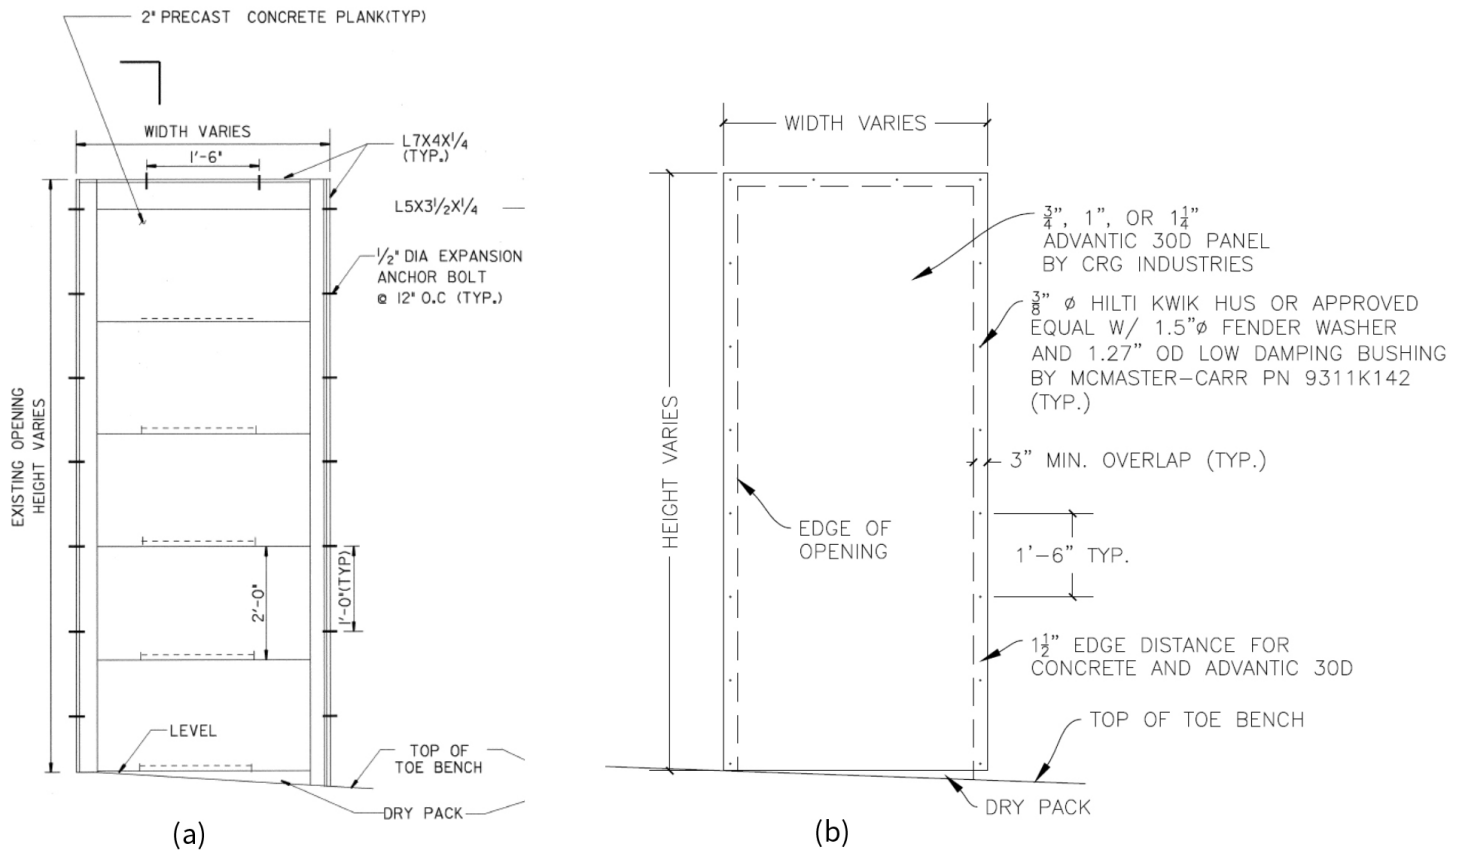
| (a) Original Precast Concrete Installation Detail, (b) Advantic Installation Detail
